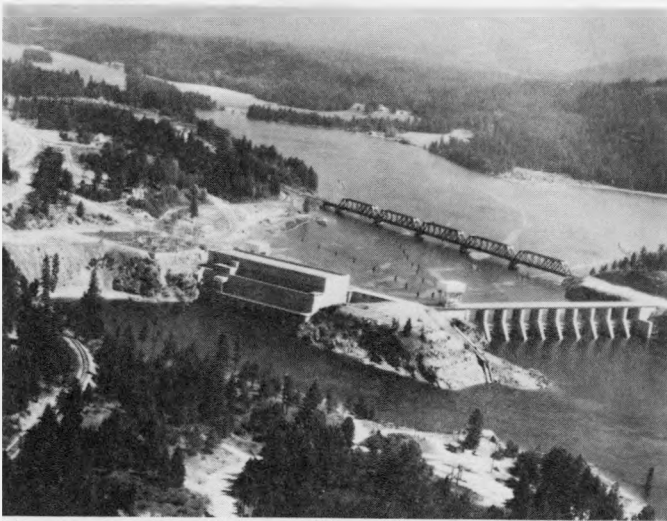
This aerial view of the Albeni Falls project shows the spillway dam at right, the powerhouse at center, and switchyard at left.
